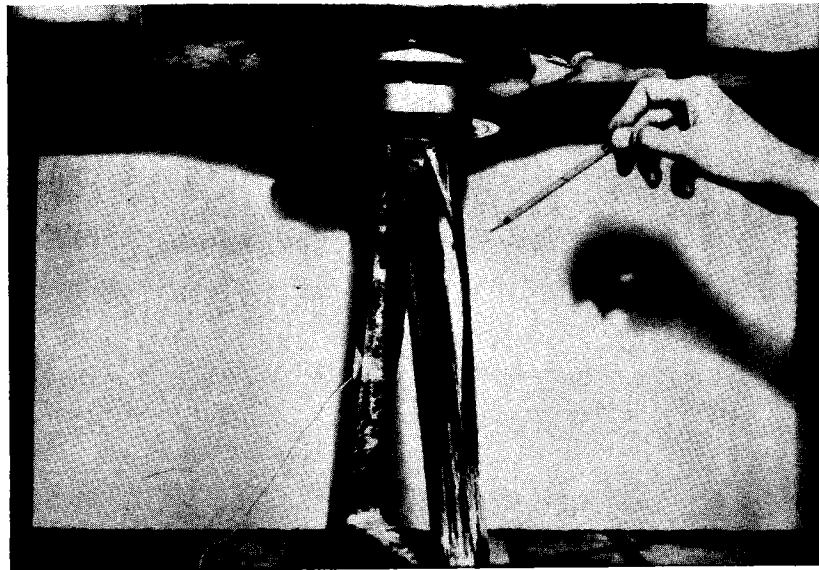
Load test of rigid stiffener showing the separation and buckling of a flange portion of the stiffener. Failure occurred at 2,500 lbs.
